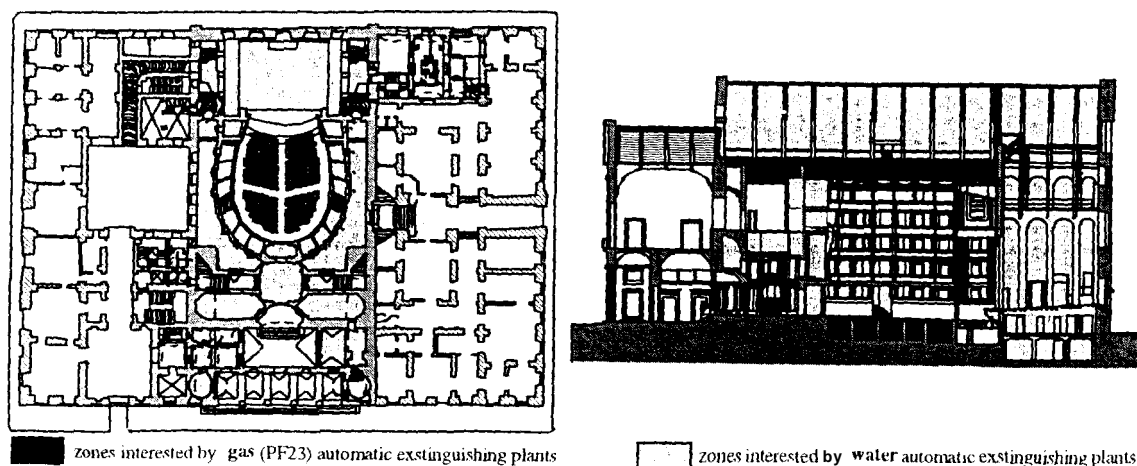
Zones interested by automatic water and gas extinguishing plants
